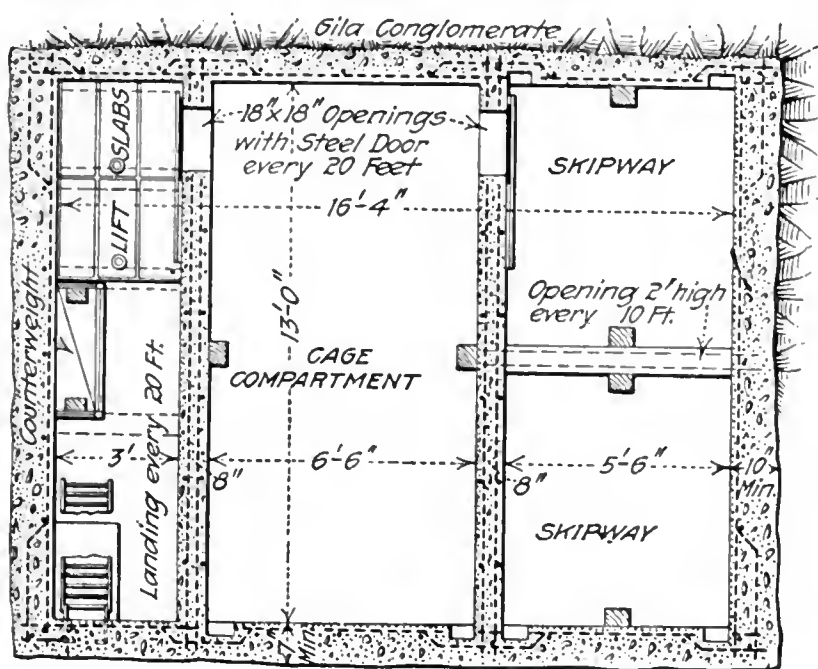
CROSS-SECTION OF SHAFT, SHOWING CONCRETE LINING
